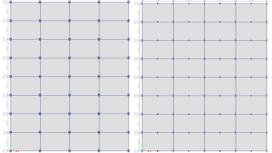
Floor Plan up to intermediate soft-story Floor Plan after intermediate soft story Figure 2.
